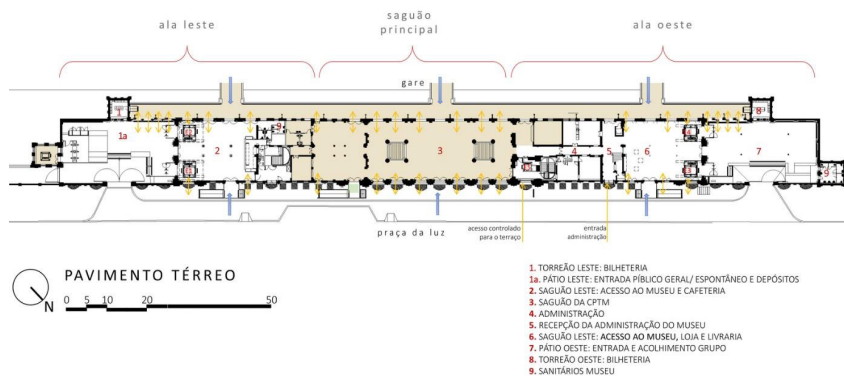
Ground Floor Plan. Pedro Mendes da Rocha Collection
